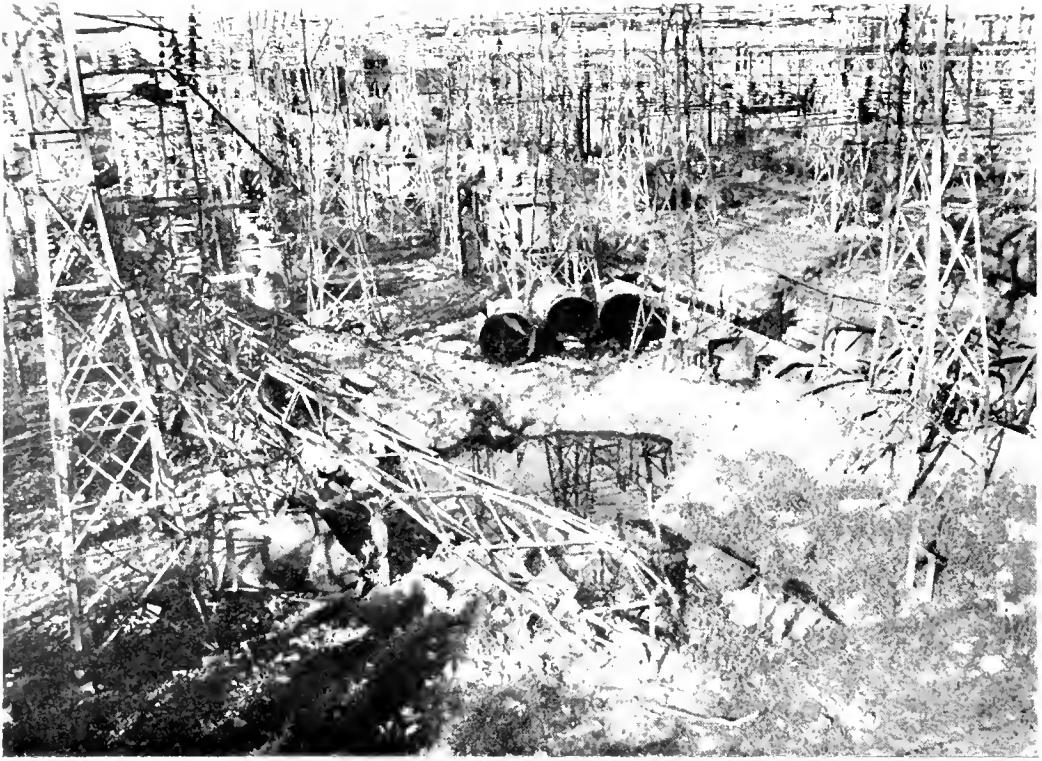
View showing damage done by rocket hit in 77-KV switching section
